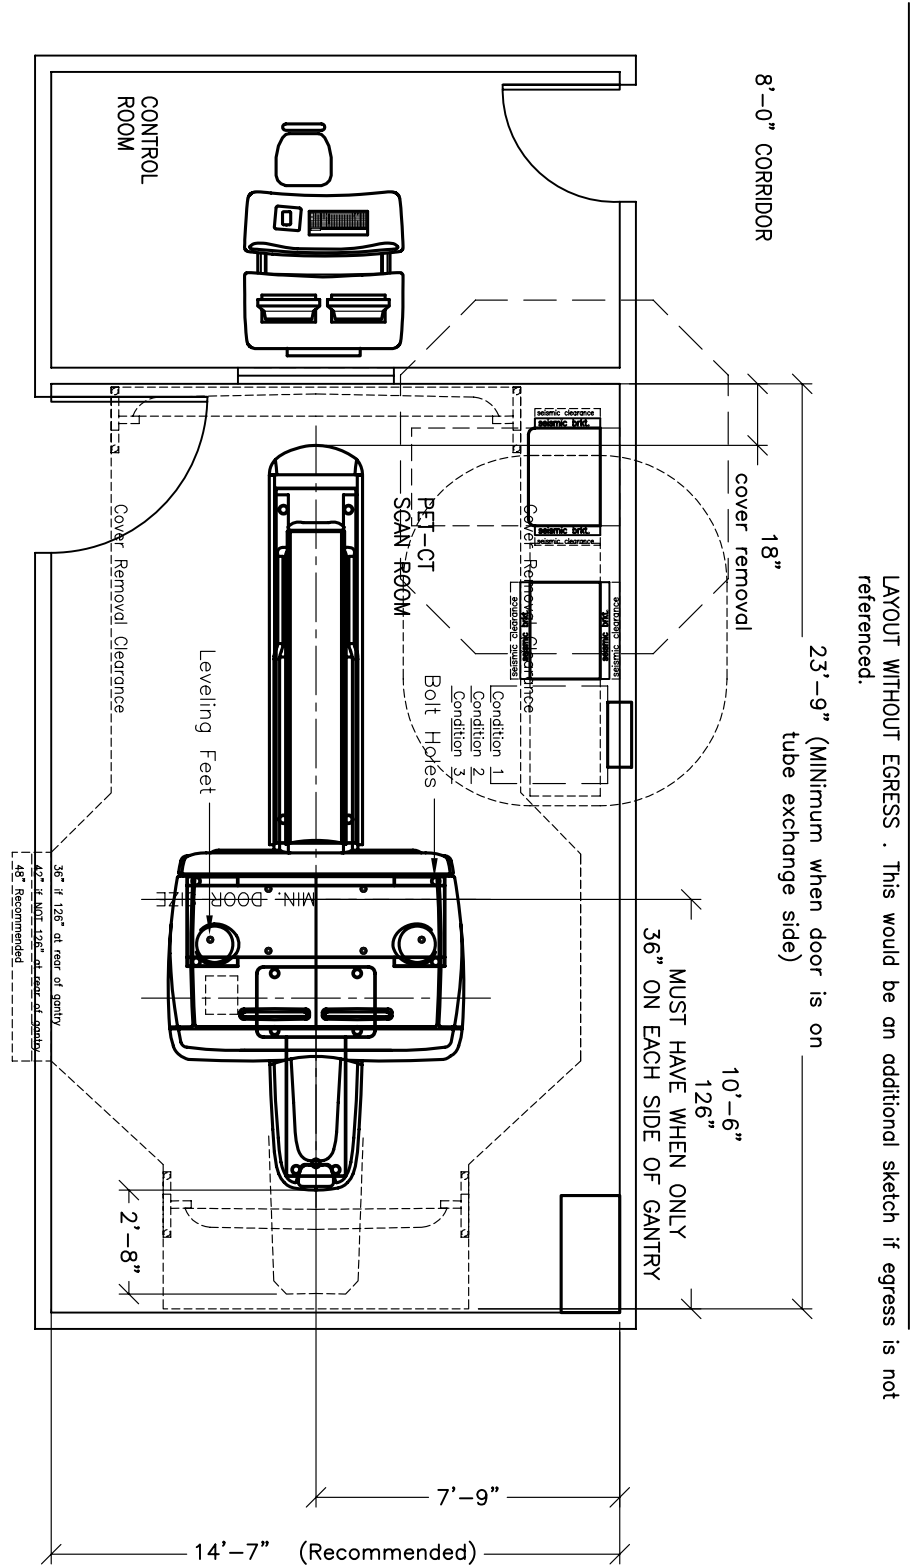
Minimum Dimensions for Room Layout with the door on the tube exchange side of the room
